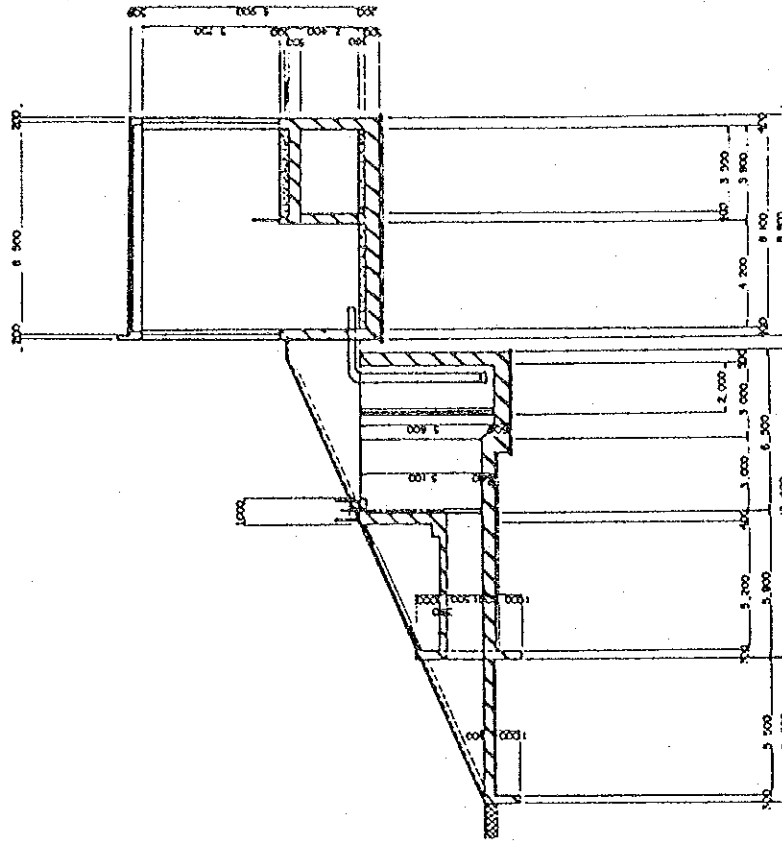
LAYOUT OF PUMP STATION (BLOCK A)
